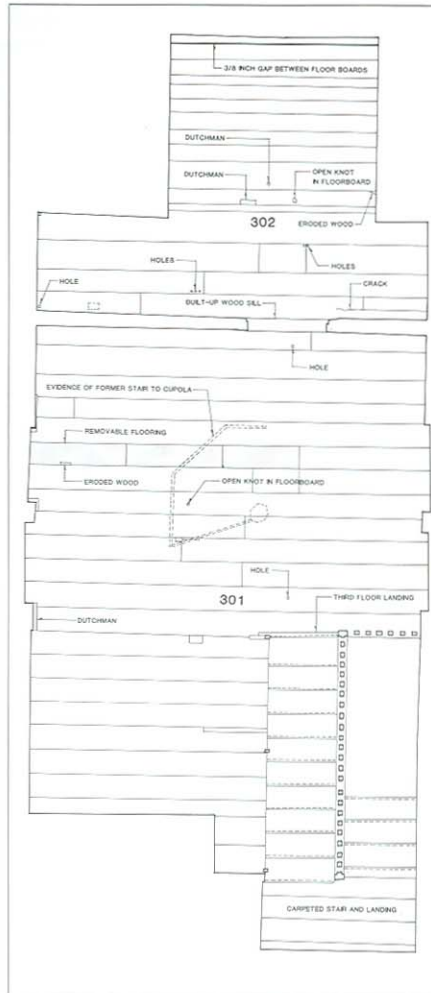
Floor plan for the third-floor stair hall, 1993. Similar plans were produced for each room of the house, based on field notes and sketches prepared under the direction of Morley Jeffers Williams in the 1930s.
